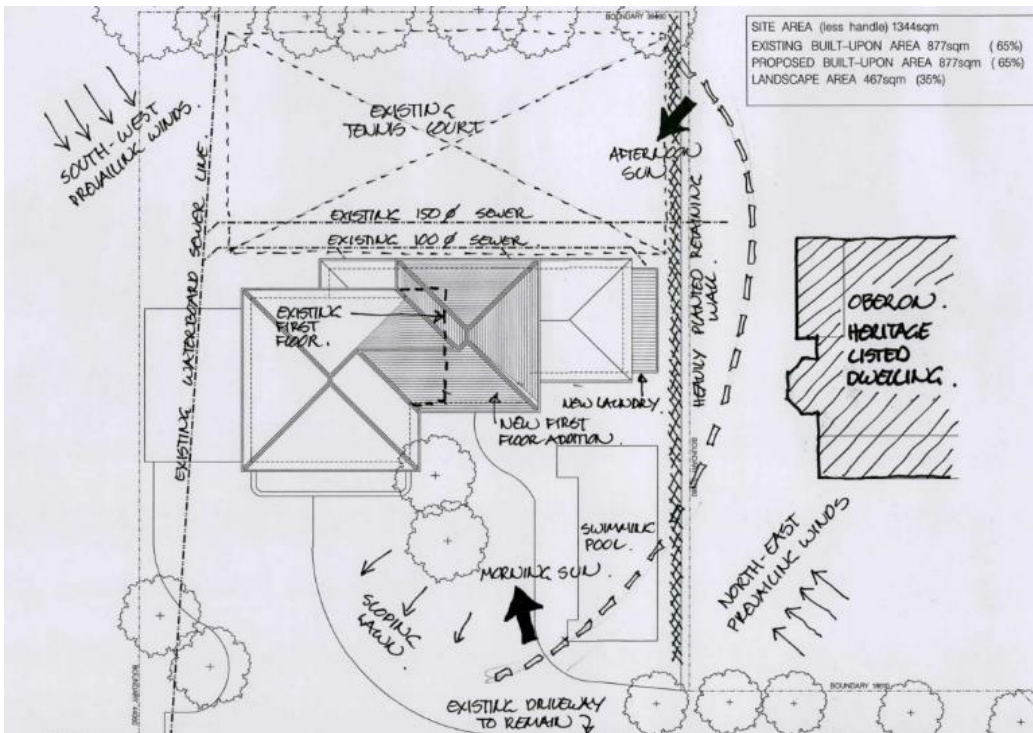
Site Analysis plan of 1A Valley Road as part of the 2008 application
